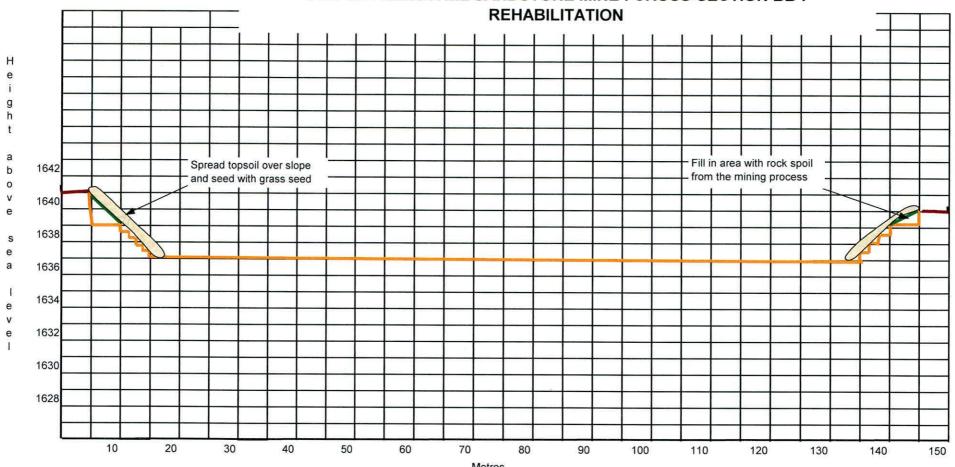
HERSCHEL SANDSTONE MINE : CROSS-SECTION BB :
